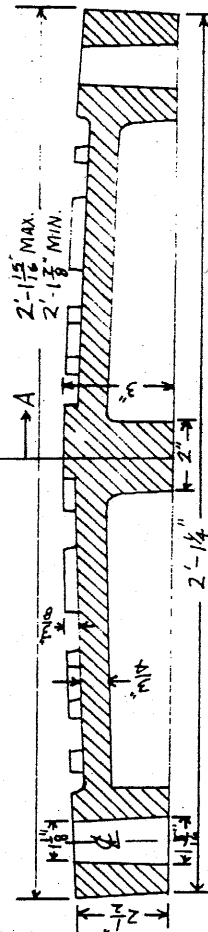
# DETAILS OF MANHOLE FRAME & COVER FOR STORM SEWERS
